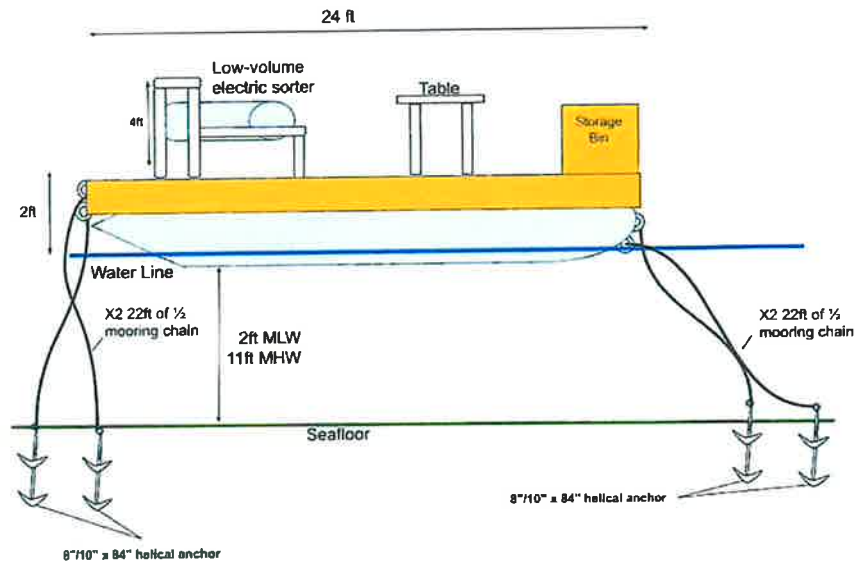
Cross-sectional view of proposed floating work platform on CAS SP2. App 10
